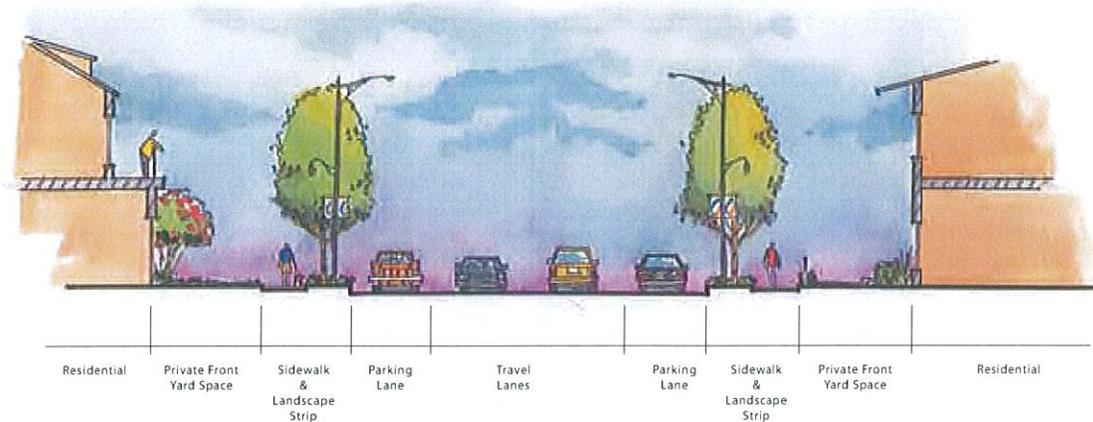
City Limits Sub-Area/Roadway Cross Section
